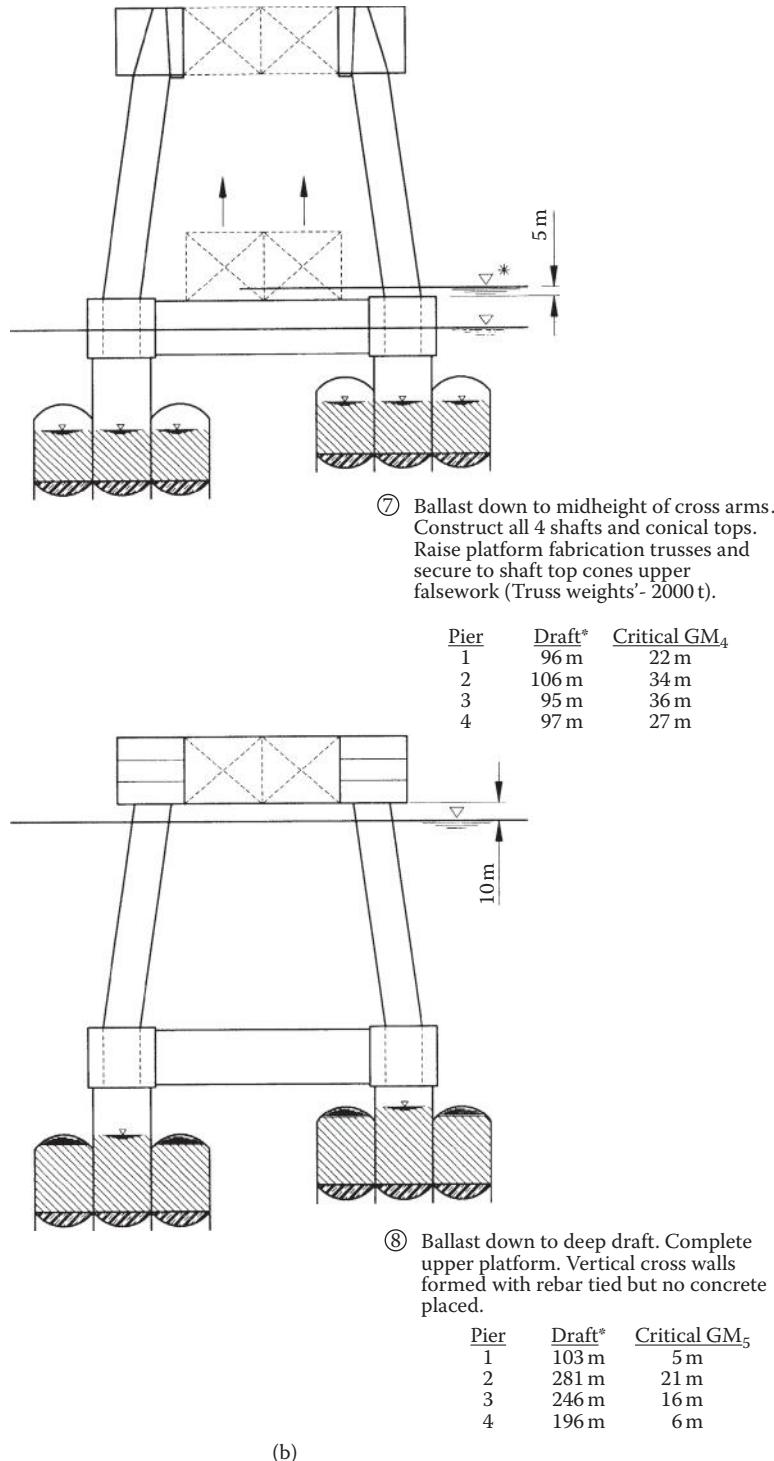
(Continued) Fabrication and installation concept for piers in 300 m water depth for crossing the Strait of Gibraltar.
